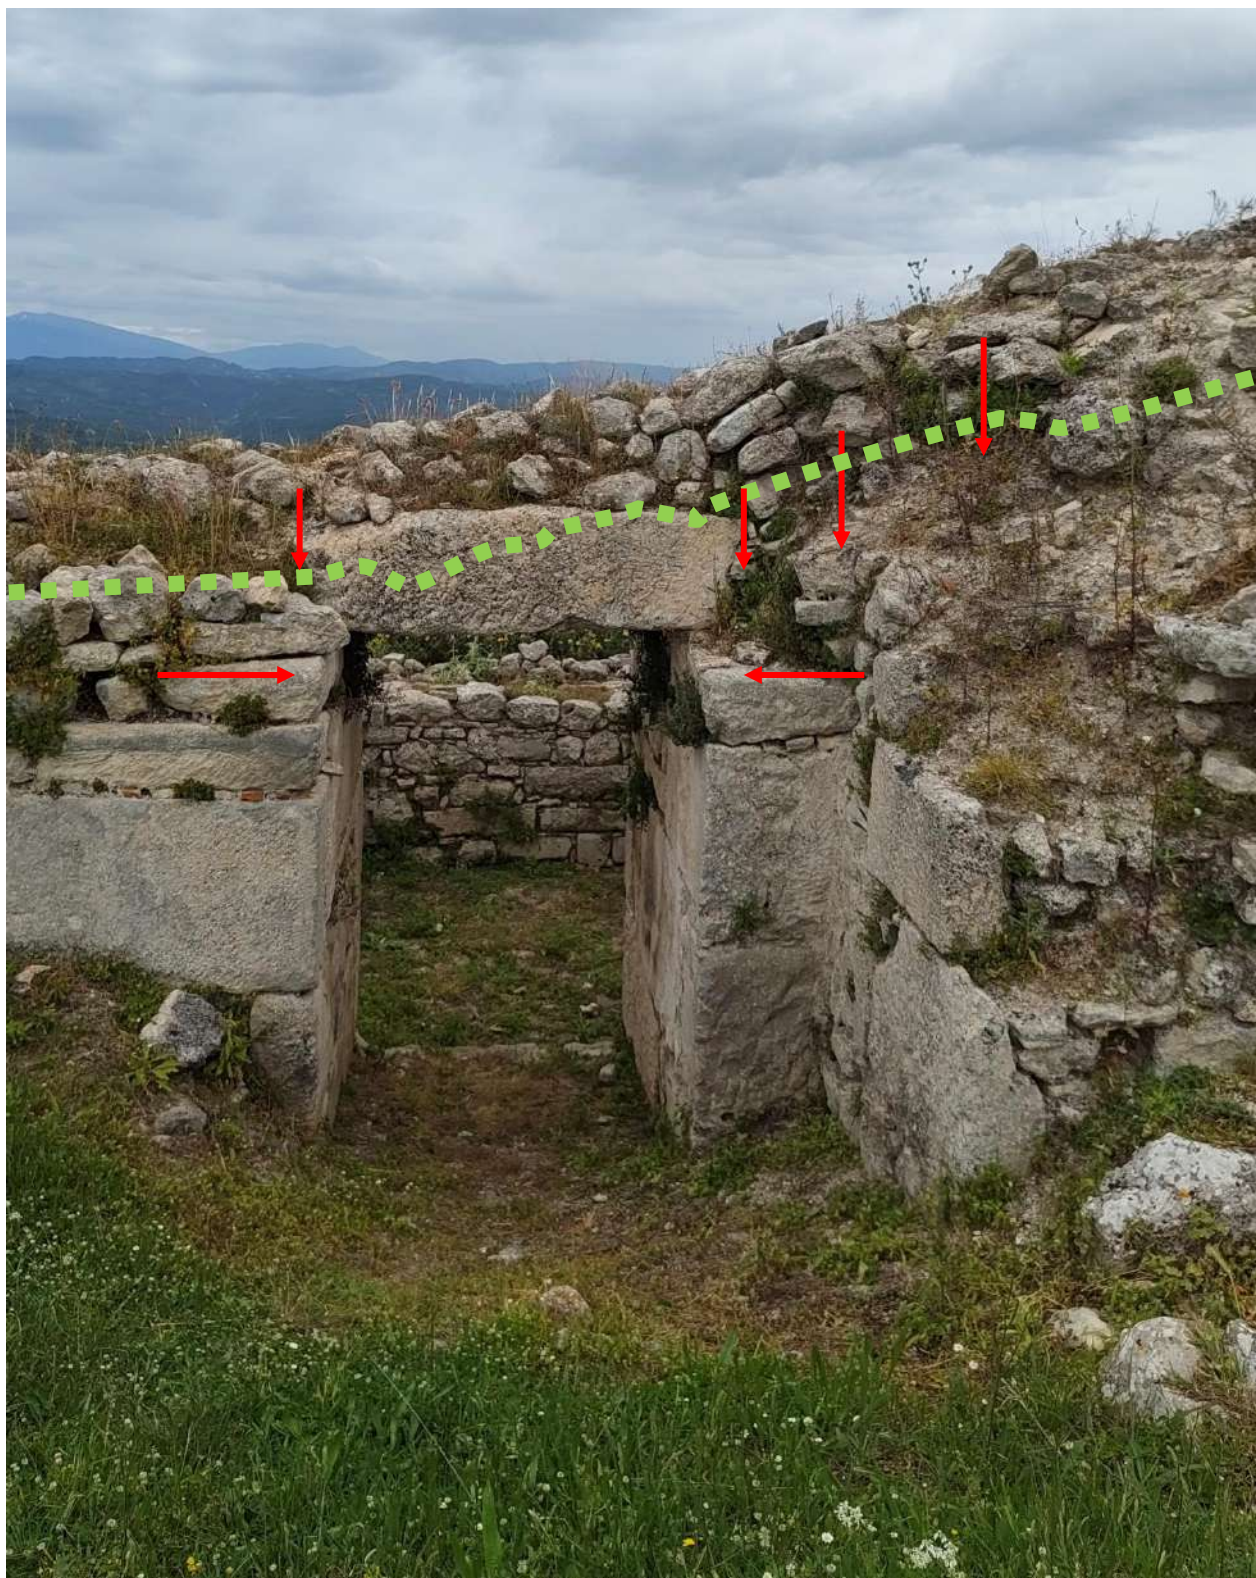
Wall crest deformations and structural failures; ineffective stabilization with improper infill (pottery fragments) and scattered, poorly executed repointing with cementitious mortar.
